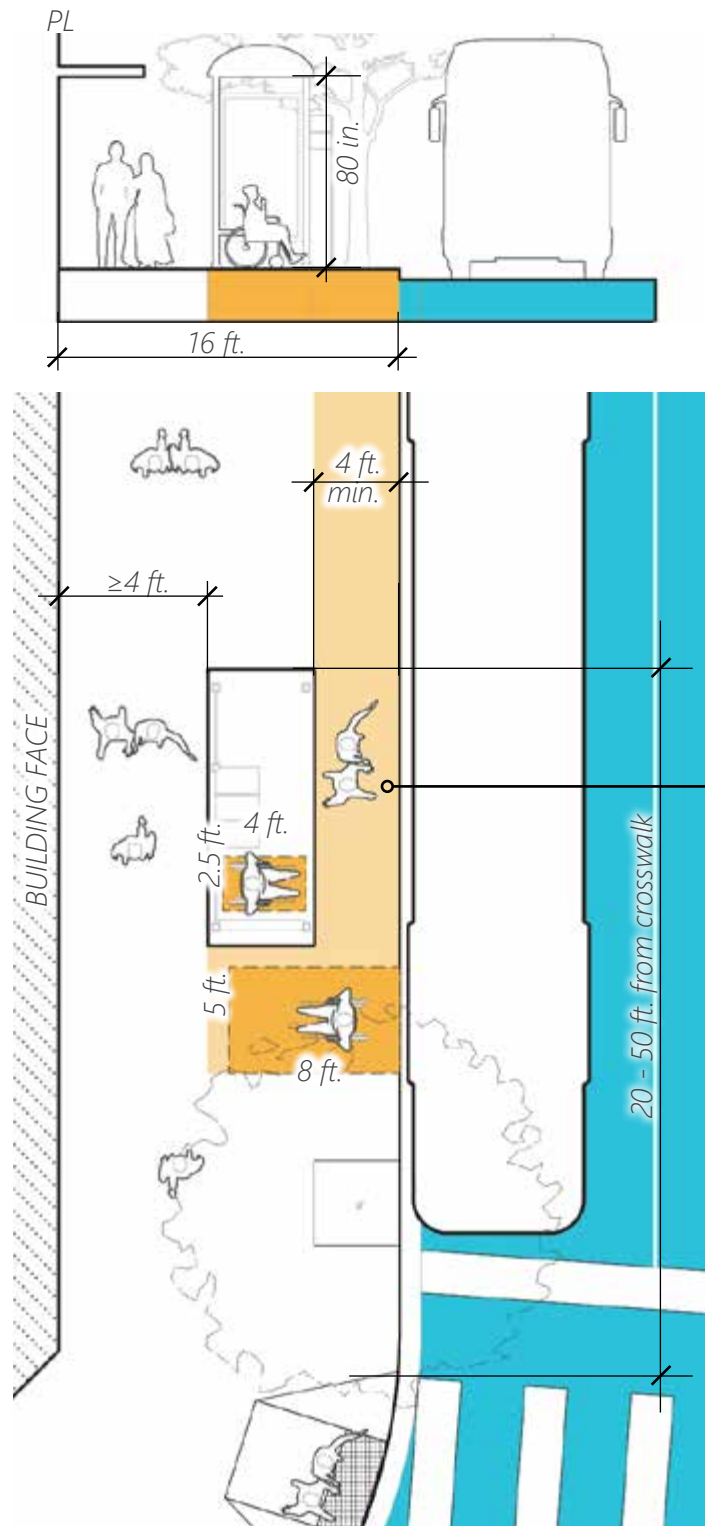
Near Side, Pull-Out Loading Bus Stop at a 16 ft. Wide Sidewalk along a Retail Street.
